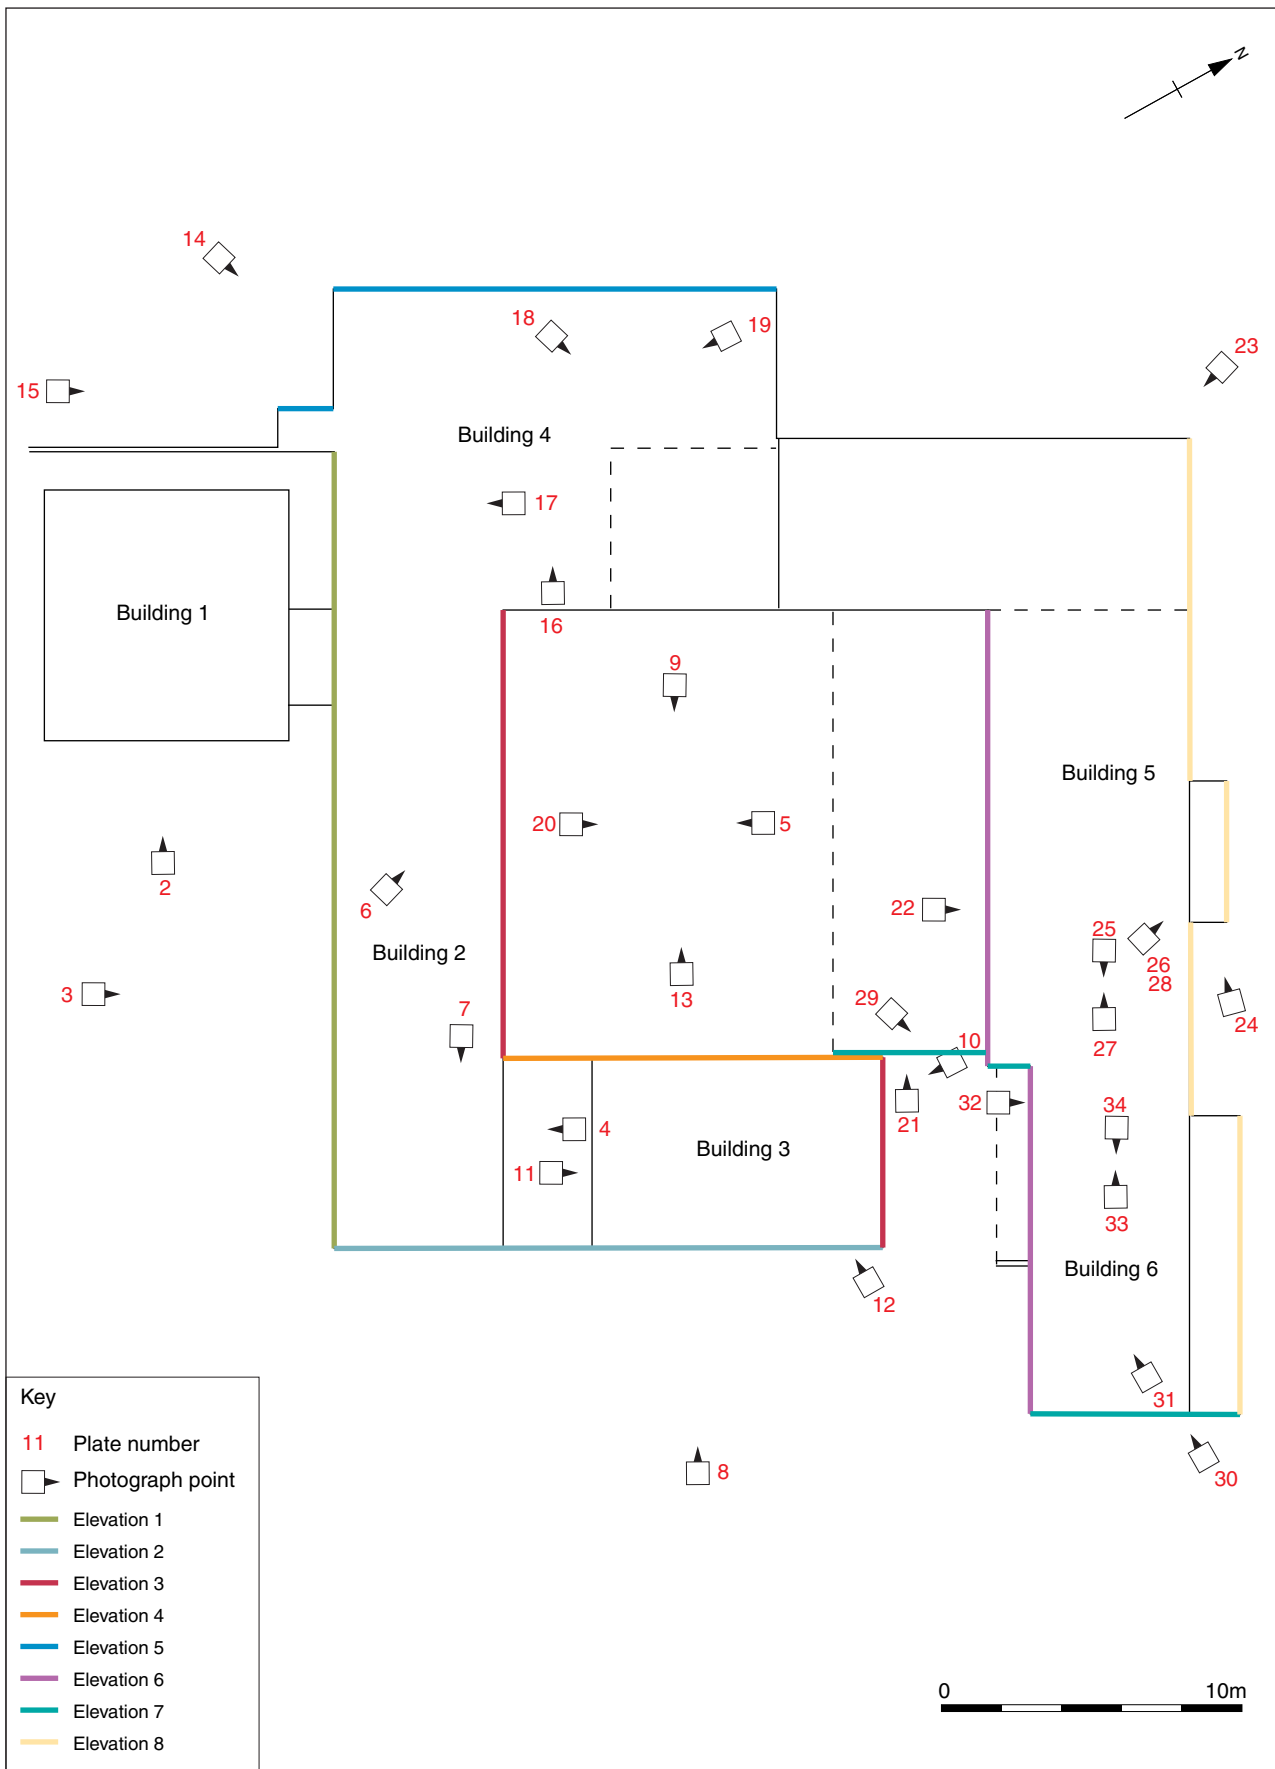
Plan of Buildings showing location of plates and elevations used in reports.
